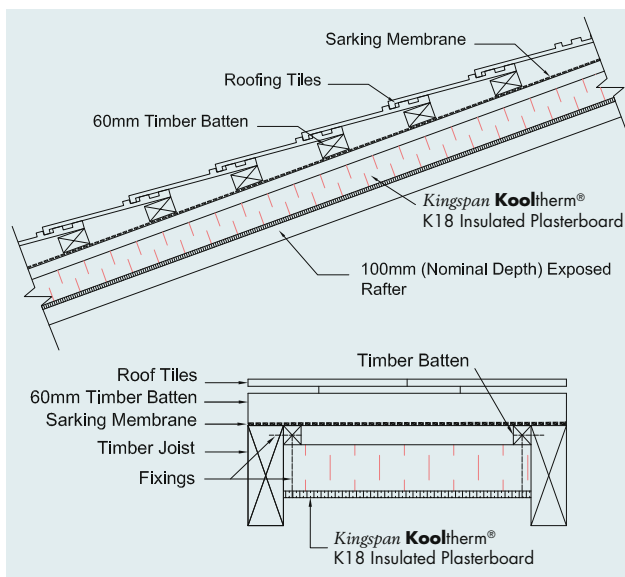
Side and front elevation - Raked ceiling (exposed beam) with *Kingspan Kooltherm*[®] K18 Insulated Plasterboard
